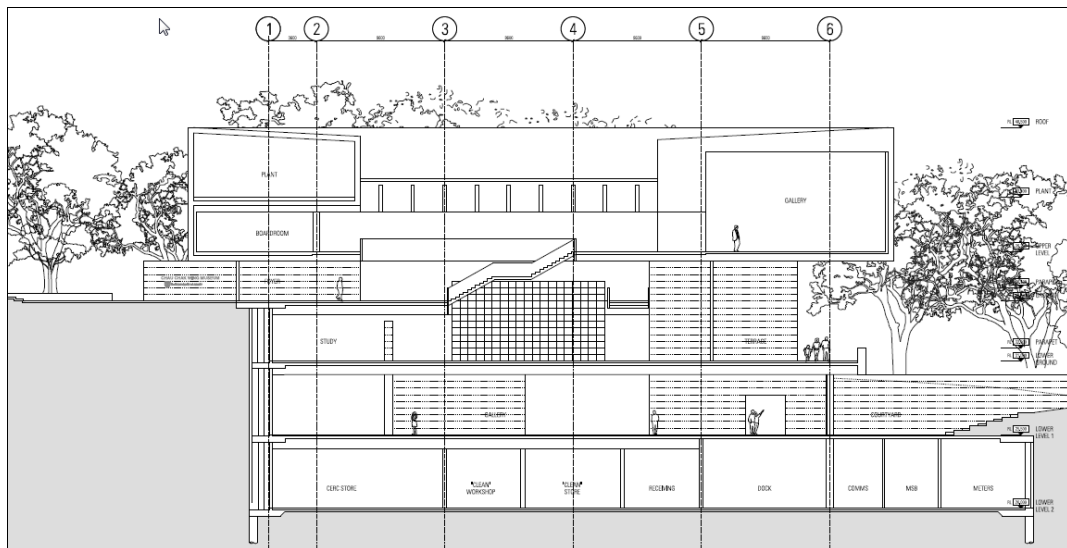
Excerpt from Option 11 Section Plan (JPW-SK-1000) showing proposed building floors and alignment. Source: JPW Architects, 10.02.2017
